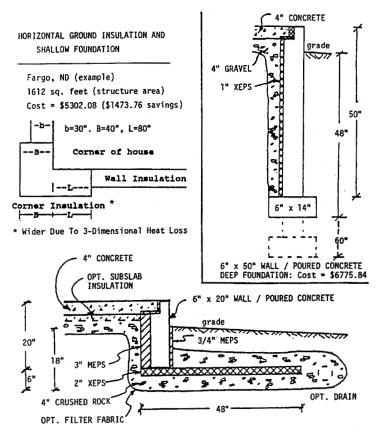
B.3 Frost-protected shallow foundation and full-frost-depth foundation.
